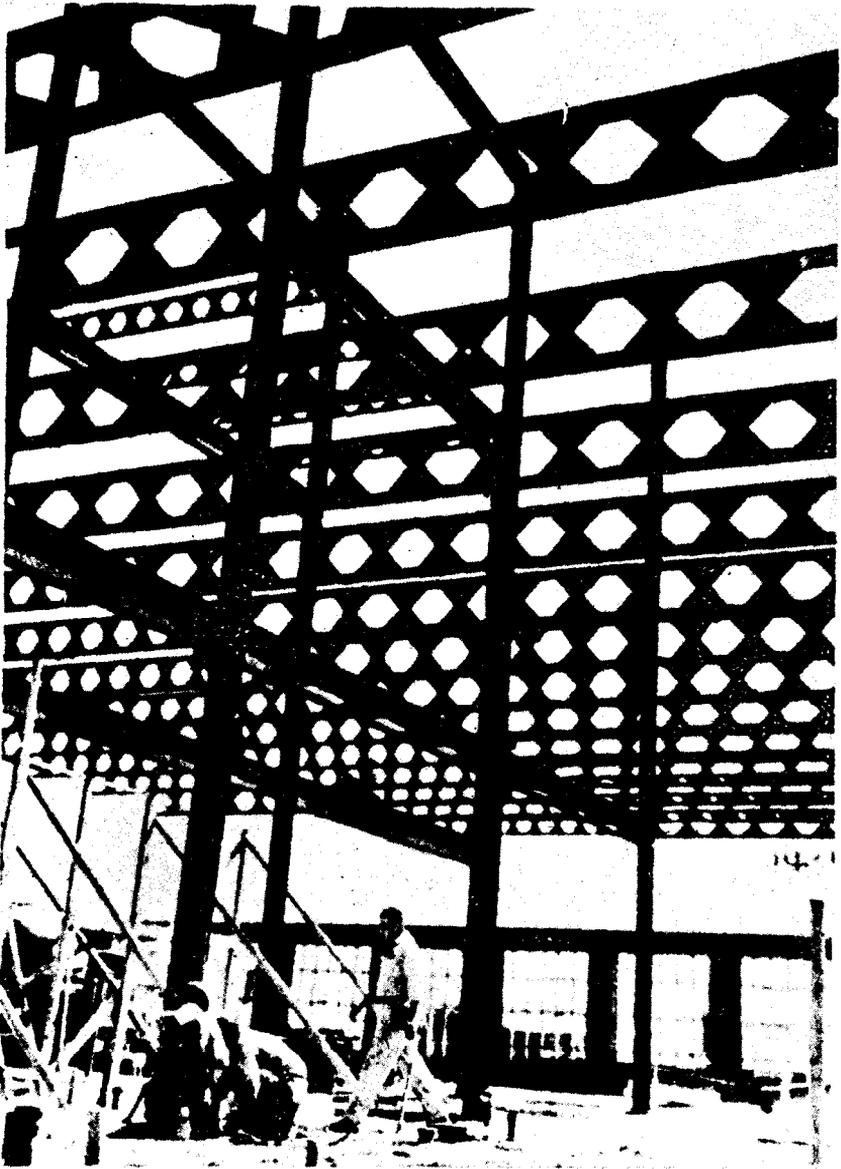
PERFORATED WEB BEAM CONSTRUCTION
